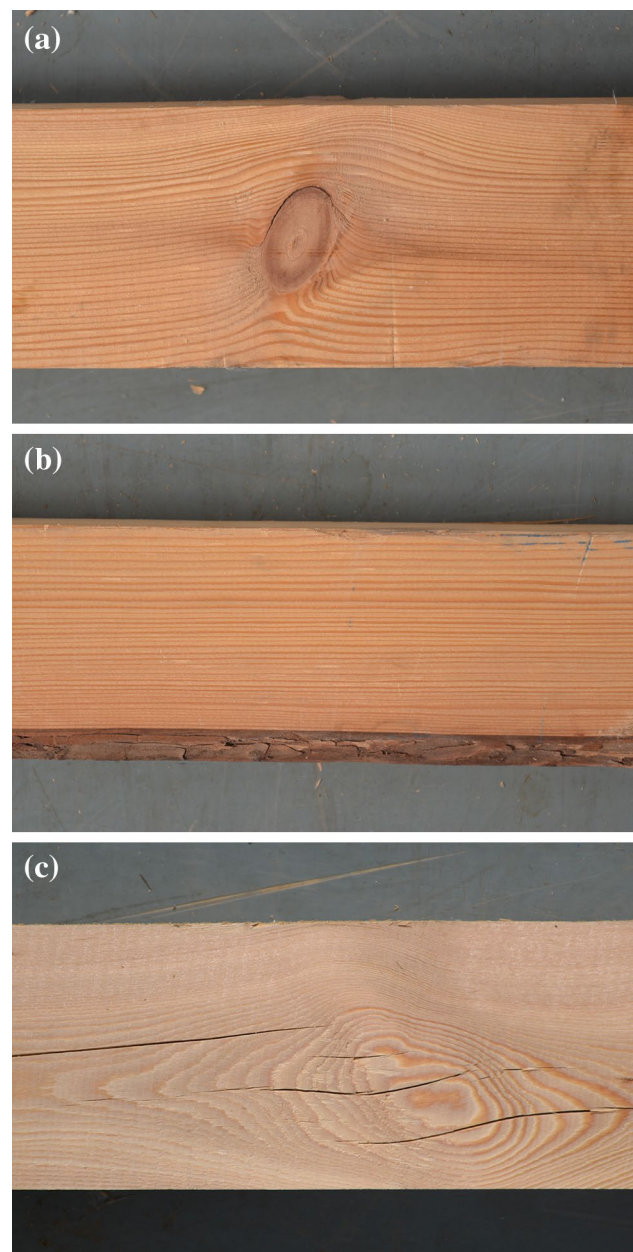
Main grade reduction defects of Chinese larch dimensional lumber: a wood knot; b waney edges; c crack
